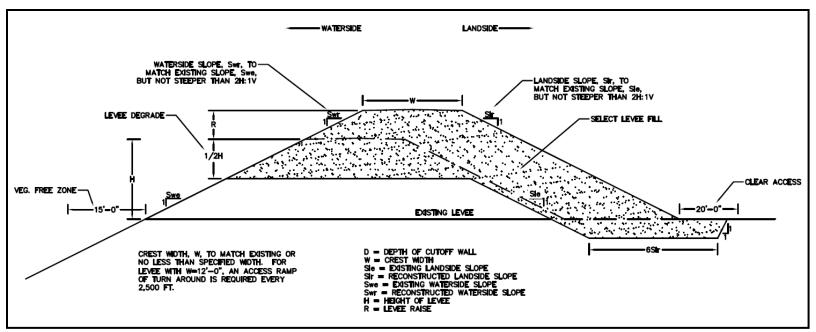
Levee Reshaping and Levee Raise Typical Plan
